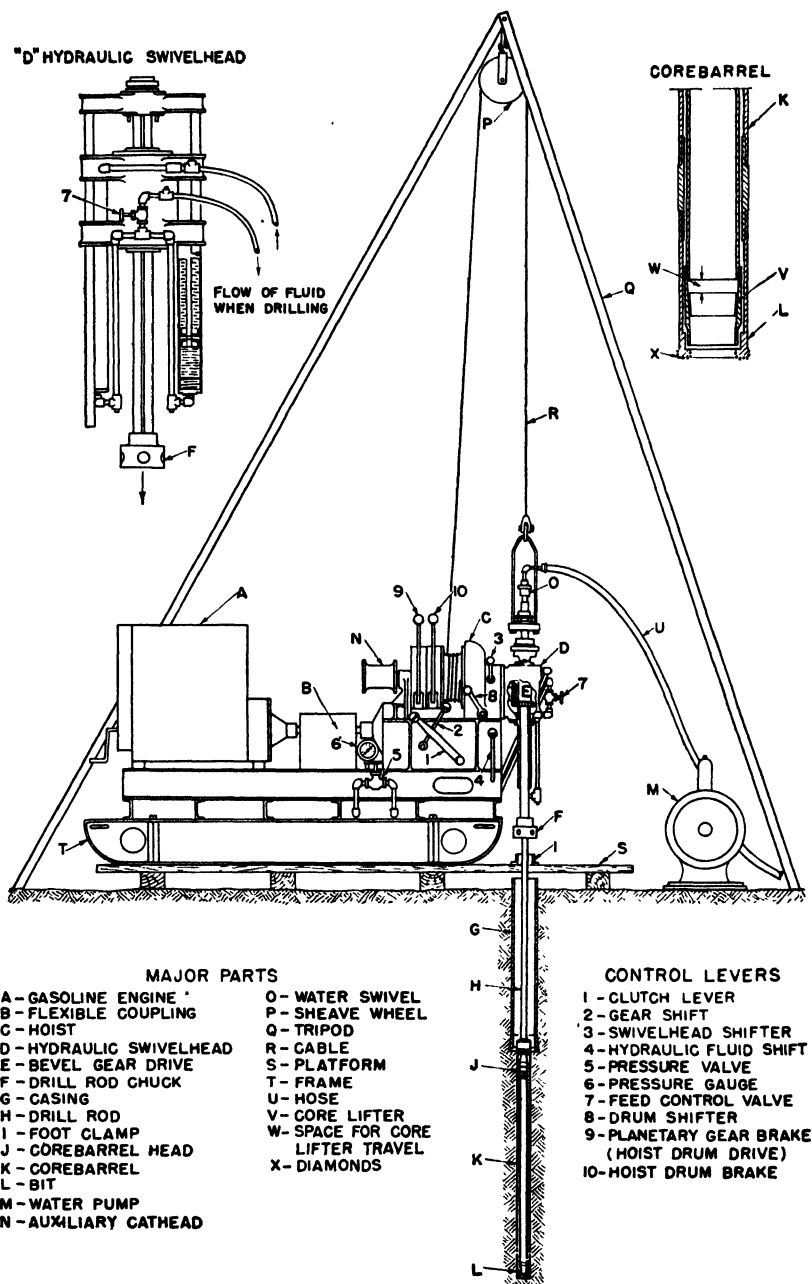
Cross section of the core-boring machine shown in Fig. 12-16. (Courtesy of Sprague & Henwood, Inc.)
